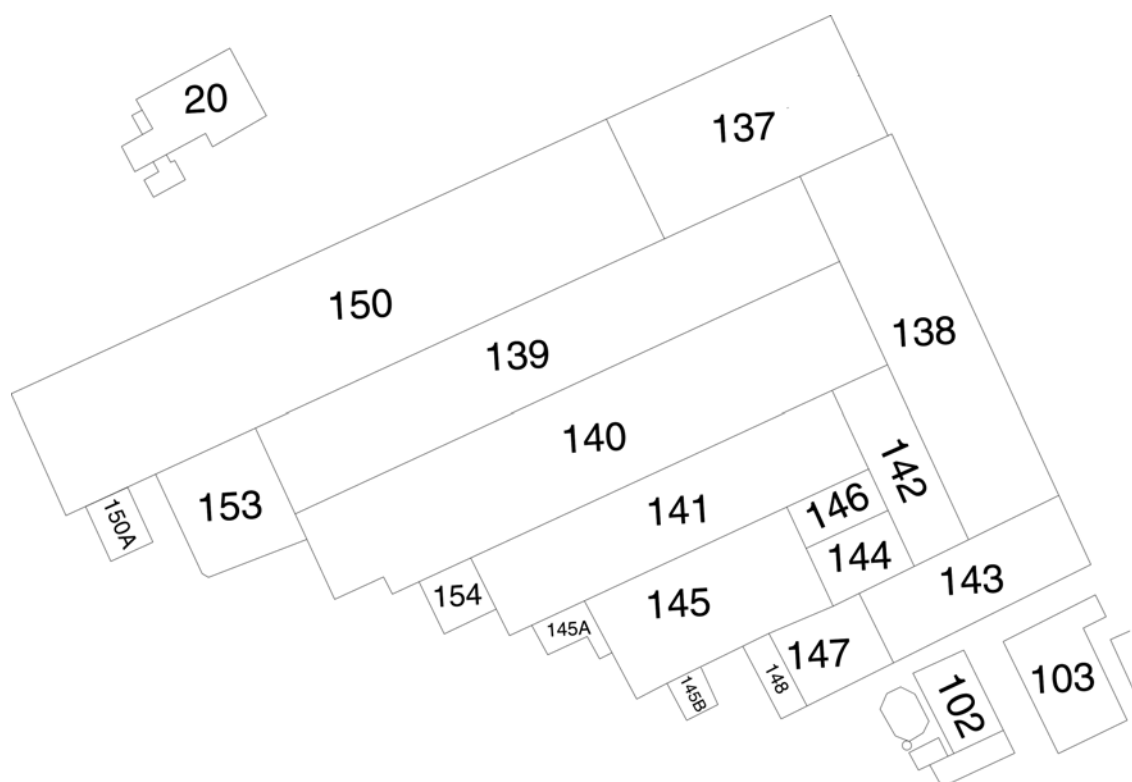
Building Nomenclature Plan (based on discussions held at CMP Workshop, 12 May 2005).
